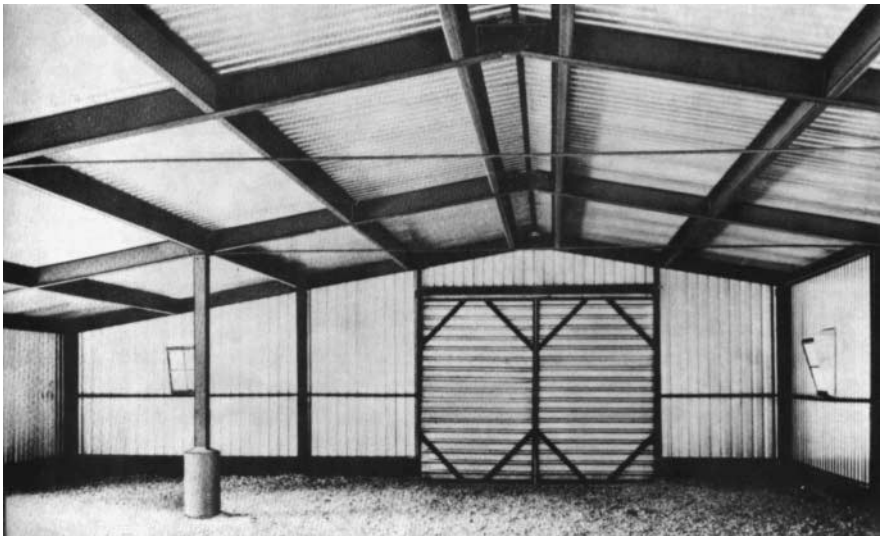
Small building made entirely of cold-formed sections. (*Stran-Steel Corporation.*)^{1.6}
